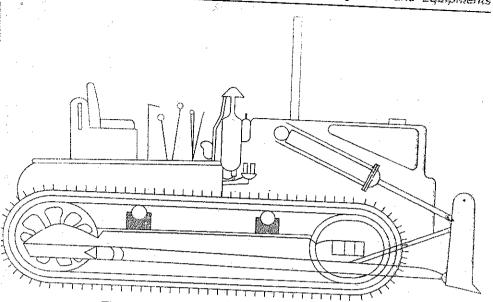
CRAWLER MOUNTED BULLDOZER
